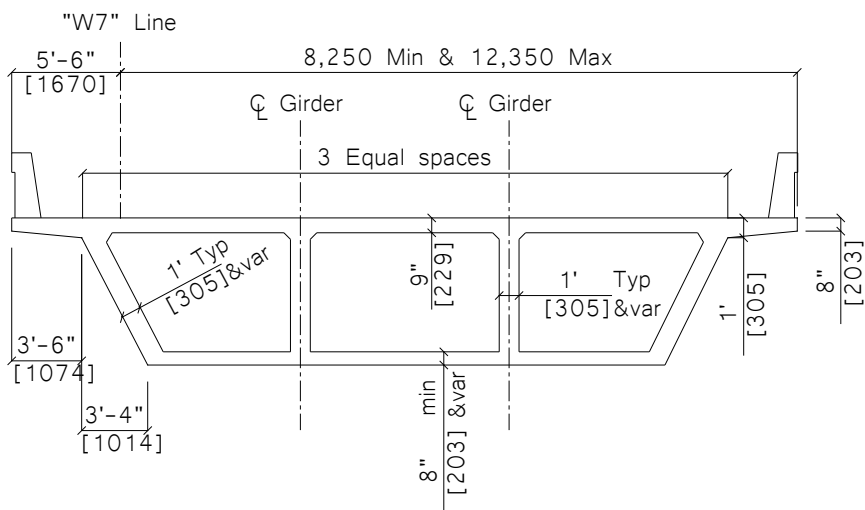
Superstructure cross-sectional details of Frame 2, Bridge 4
